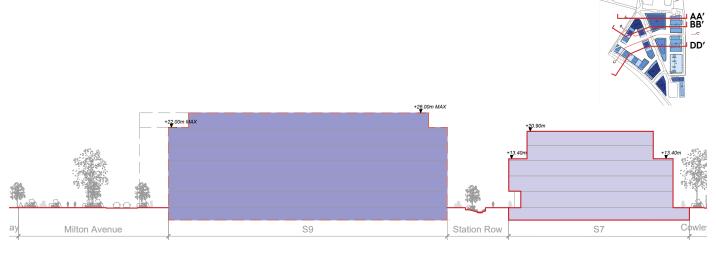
Parameter Section AA' - Building S9 east-west parameter section (north side)
